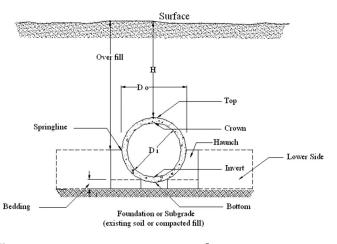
Standard installation terminology [adapted with permission from *Concrete Pipe Technology Handbook* (ACPA)]
